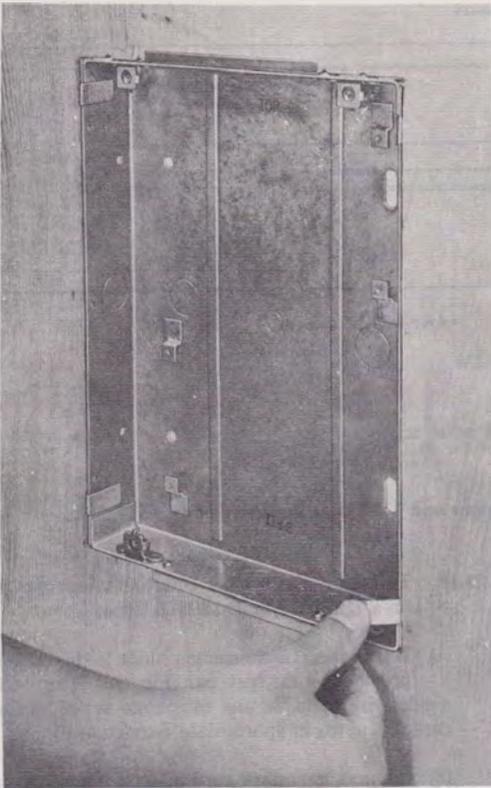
113E Apparatus Box with D-179941 Kit of Parts Installed
